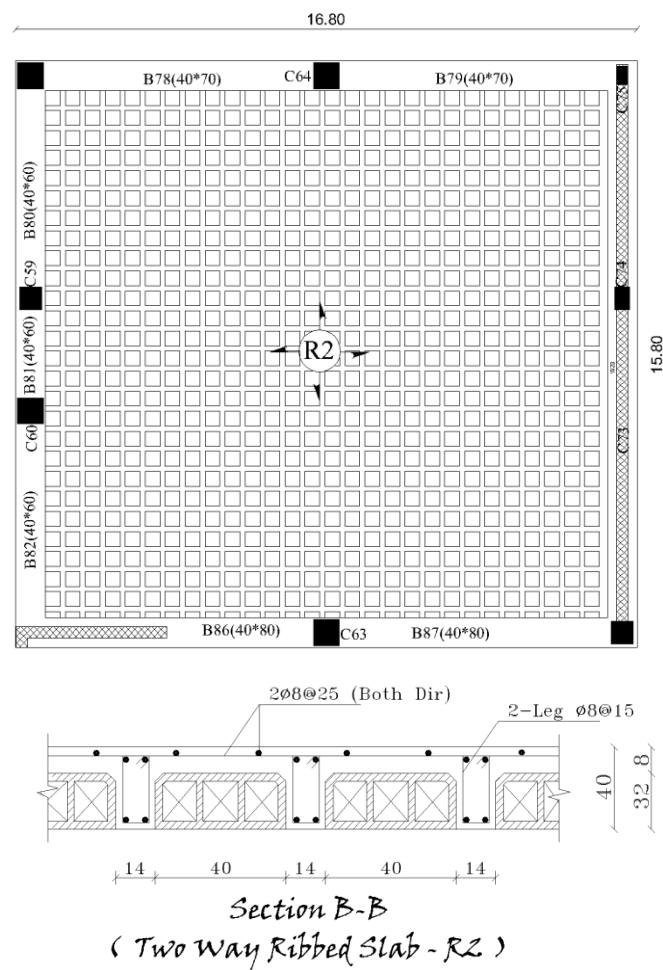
Plan and Section in Two Way Ribbed Slab ( R2 )
